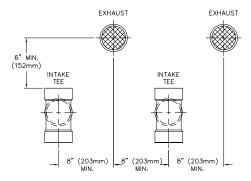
Vent Pipe Spacing for Multiple PUREFIRE® Boilers
